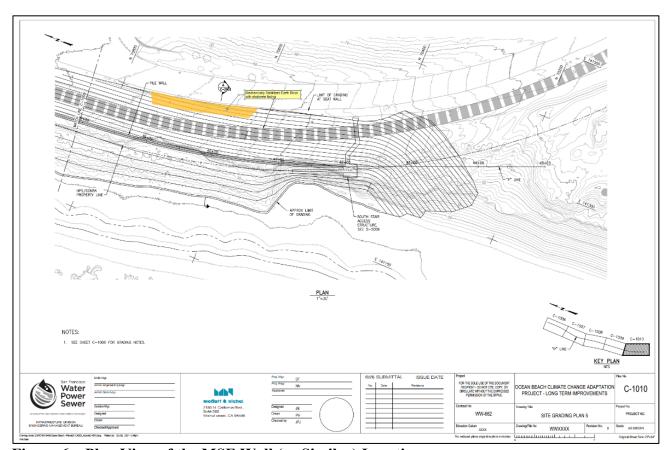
Plan View of the MSE Wall (or Similar) Location
